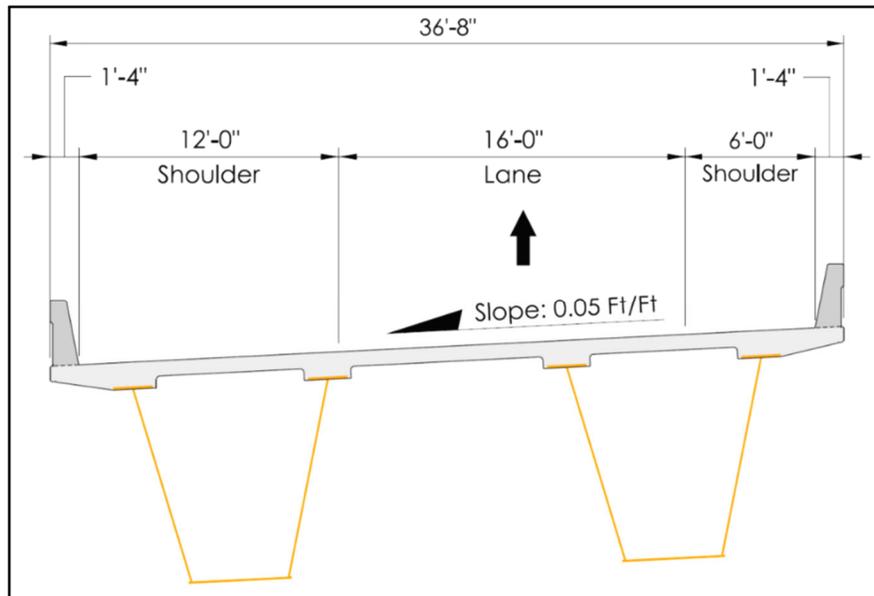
Proposed Bridge 4 Typical Section, Steel Box Option
